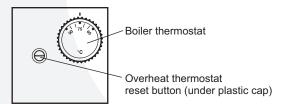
Boiler House dual thermostat (on top of boiler)
